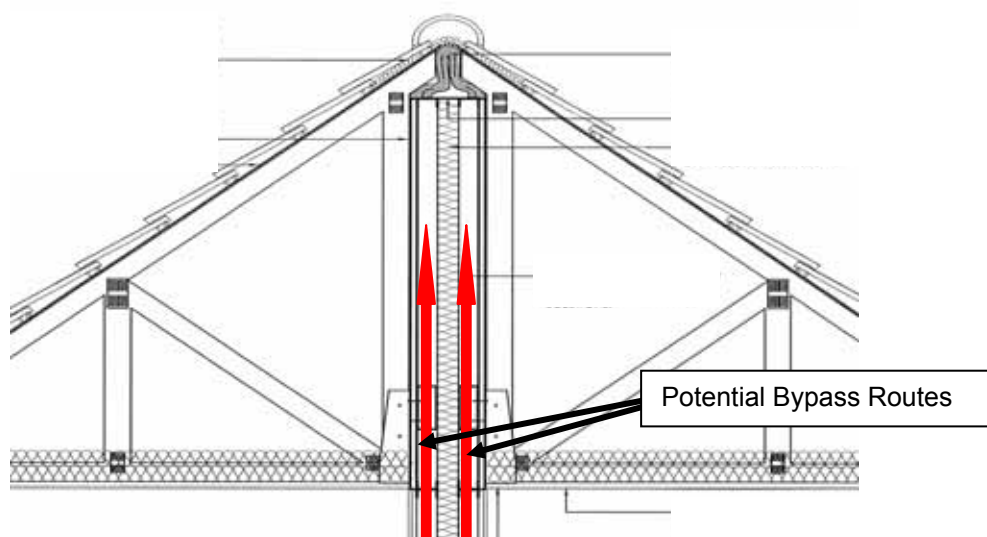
Party Wall Detail for Steel Framed Dwelling
